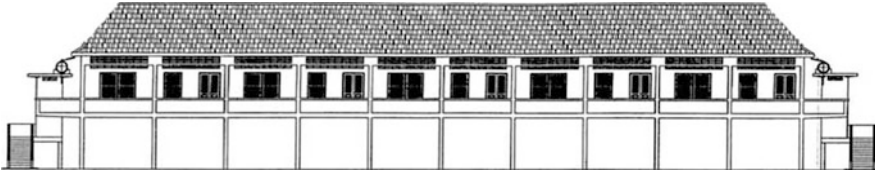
Proposed 11.50 ft elevated school building (*Source* ADPC, 2008)
